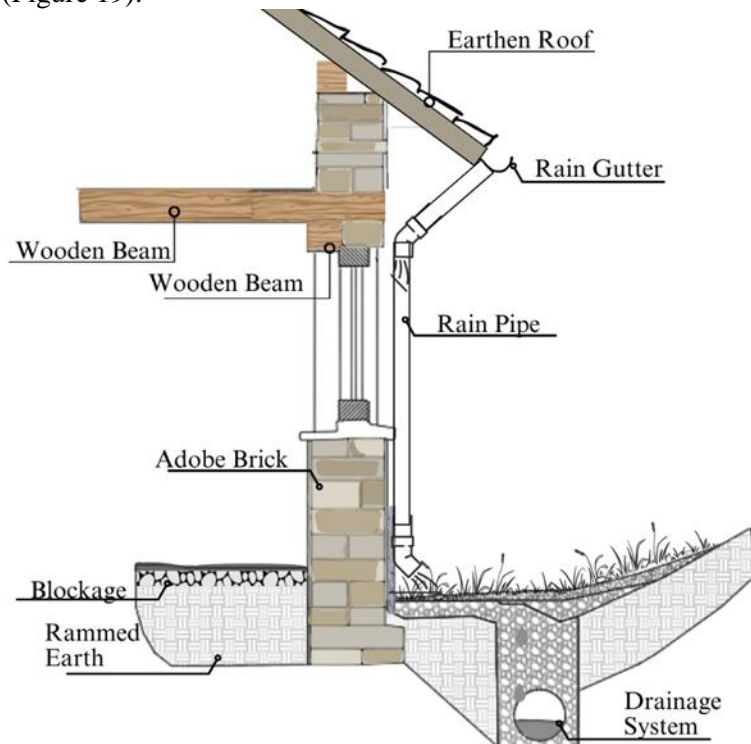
Roof solution instead of the existing earth roof in adobe building.
